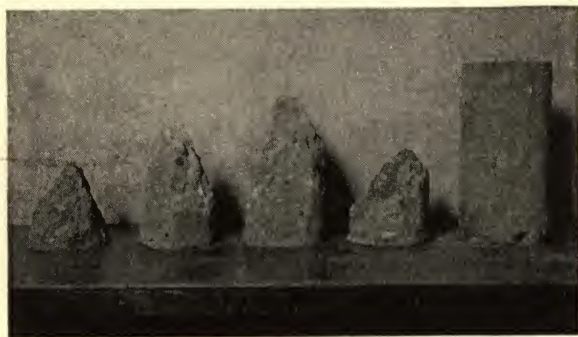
Typical Breaks of Concrete Test Cylinders
